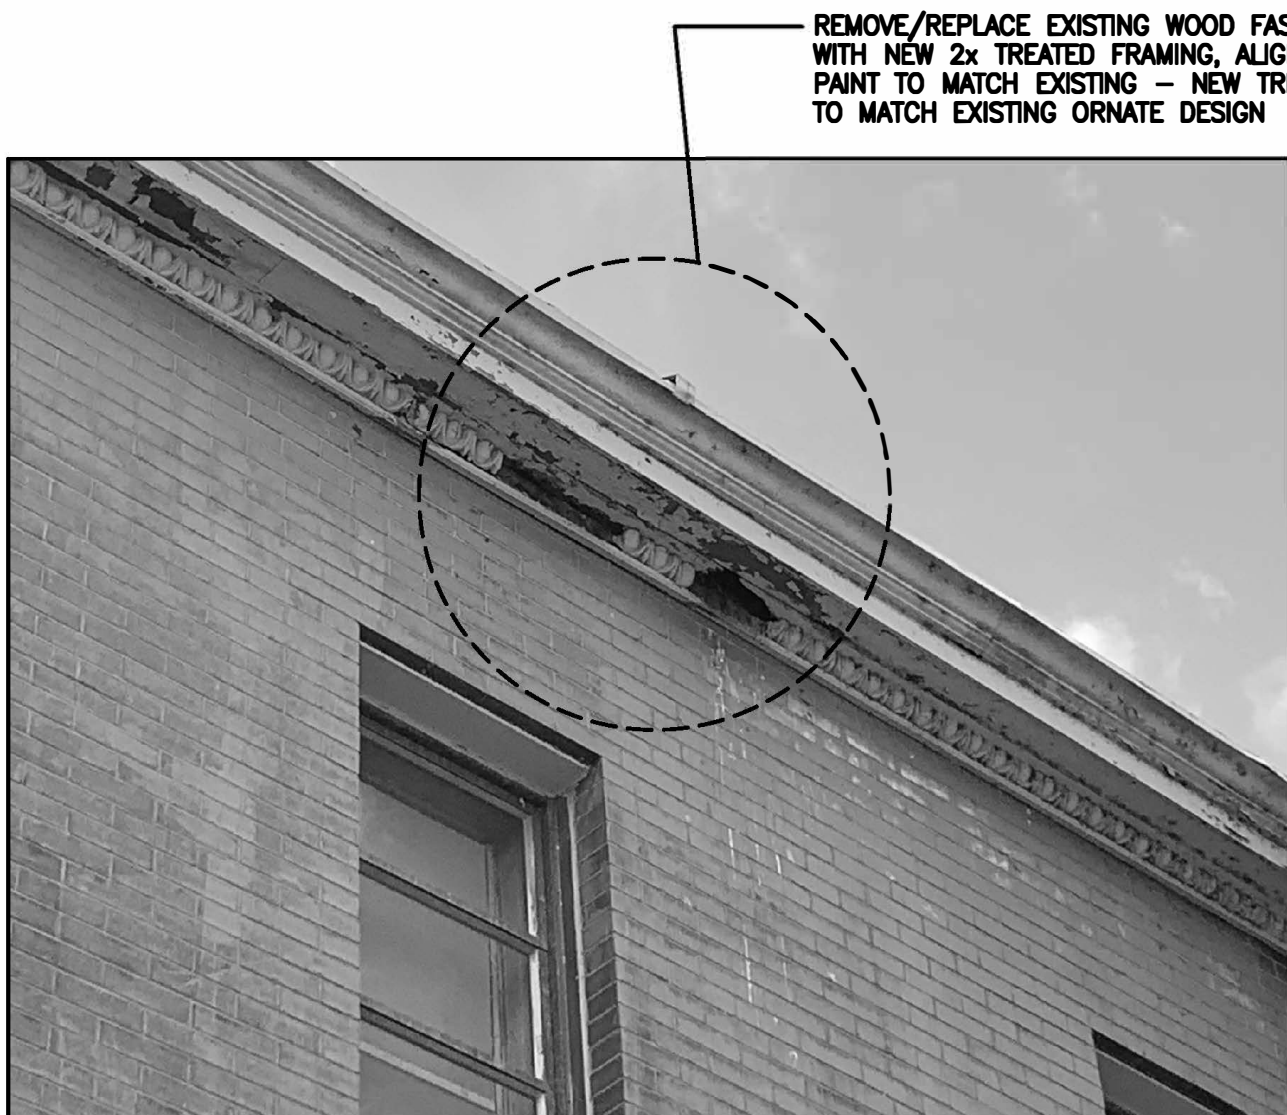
TYPICAL EXISTING TRIM REPAIR/REPLACEMENT
